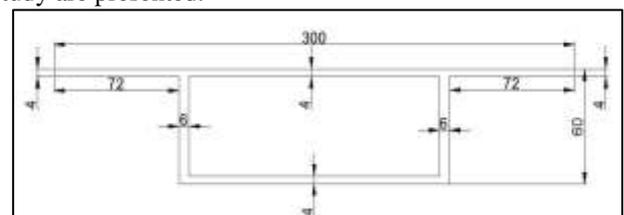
Cross Section of Simply Supported Box Girder Bridge considered for study
